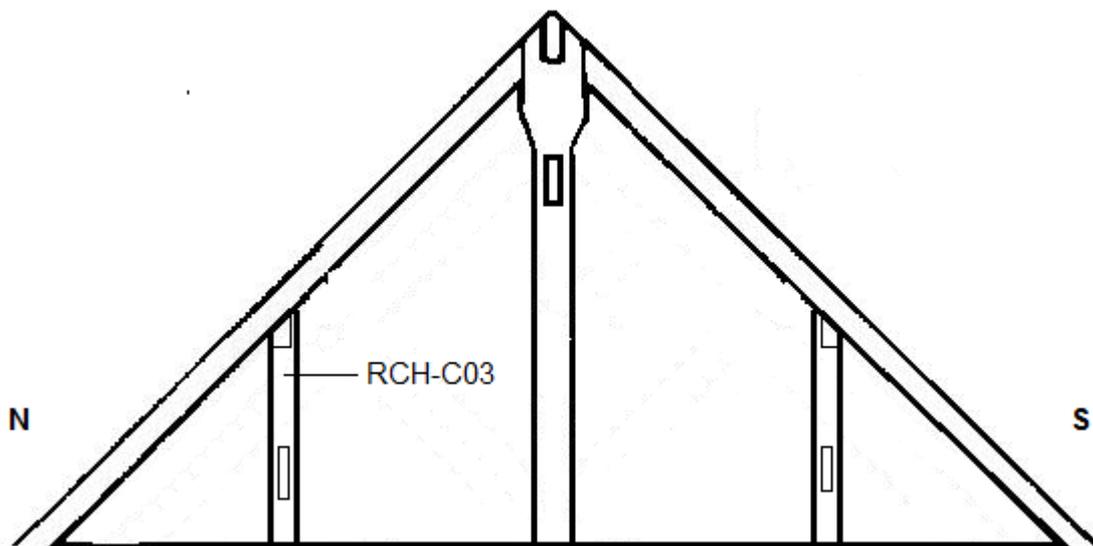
Sketch of truss 2, showing the location of sample RCH-C03
